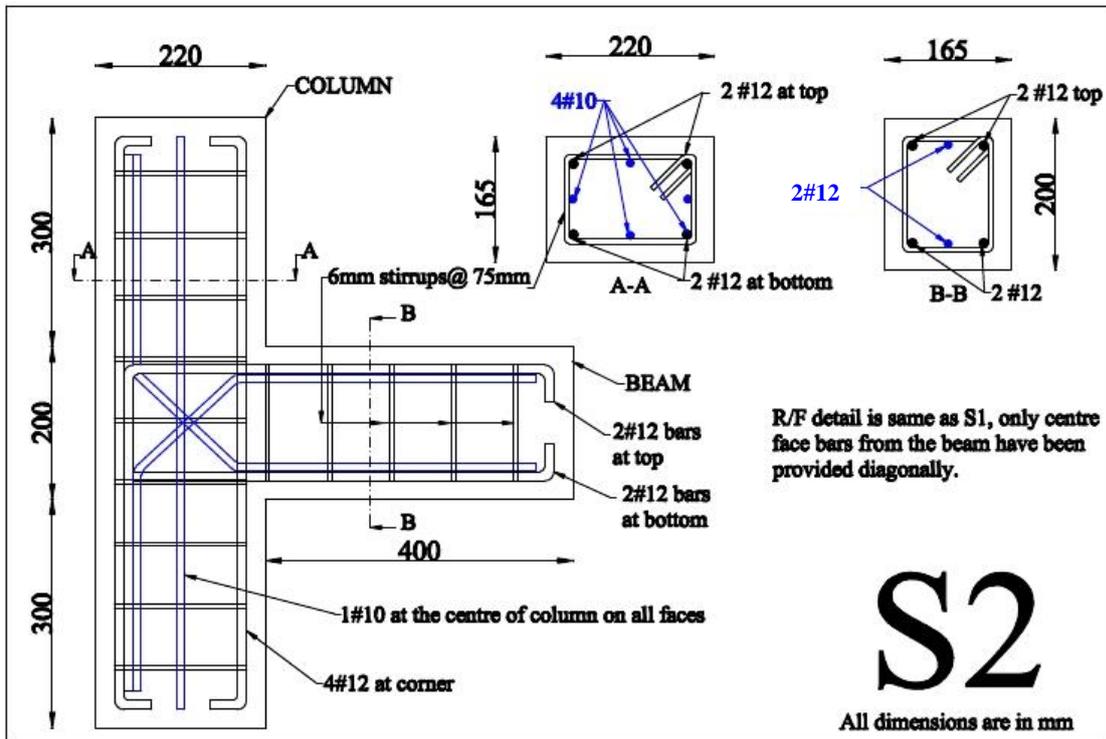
Reinforcement arrangement with diagonally crossed bars
